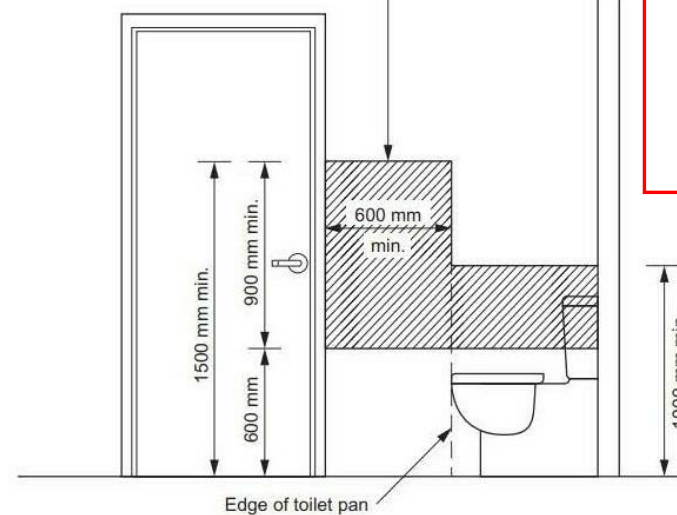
Location of sheeting for a wall behind a toilet pan
